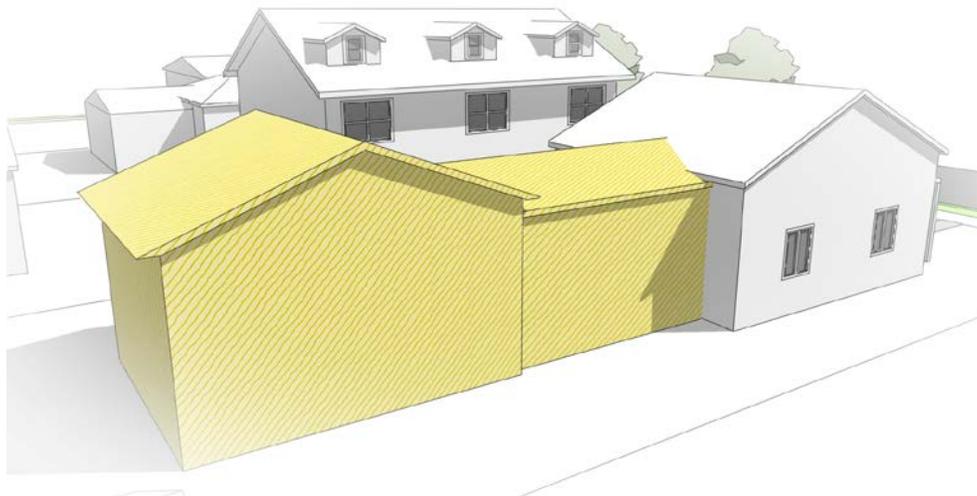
Use of change in building massing to provide a subtle distinction where an addition (shown in yellow) meets the original building form.
